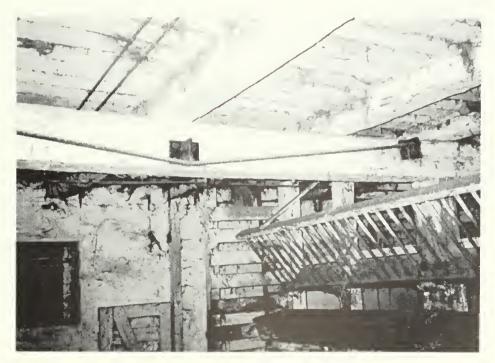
Steel reinforcement at basement beam of Piper Barn.
